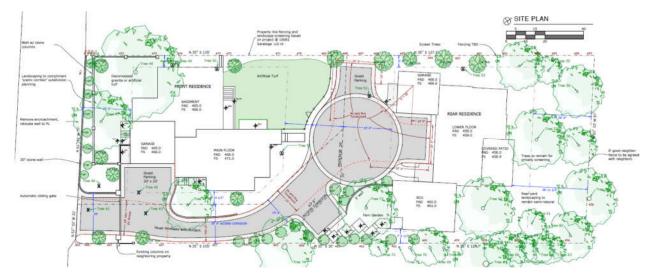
Proposed Site Plan (Source: Plan Set prepared by T.H.I.S. Design and Development, dated November 2020)
